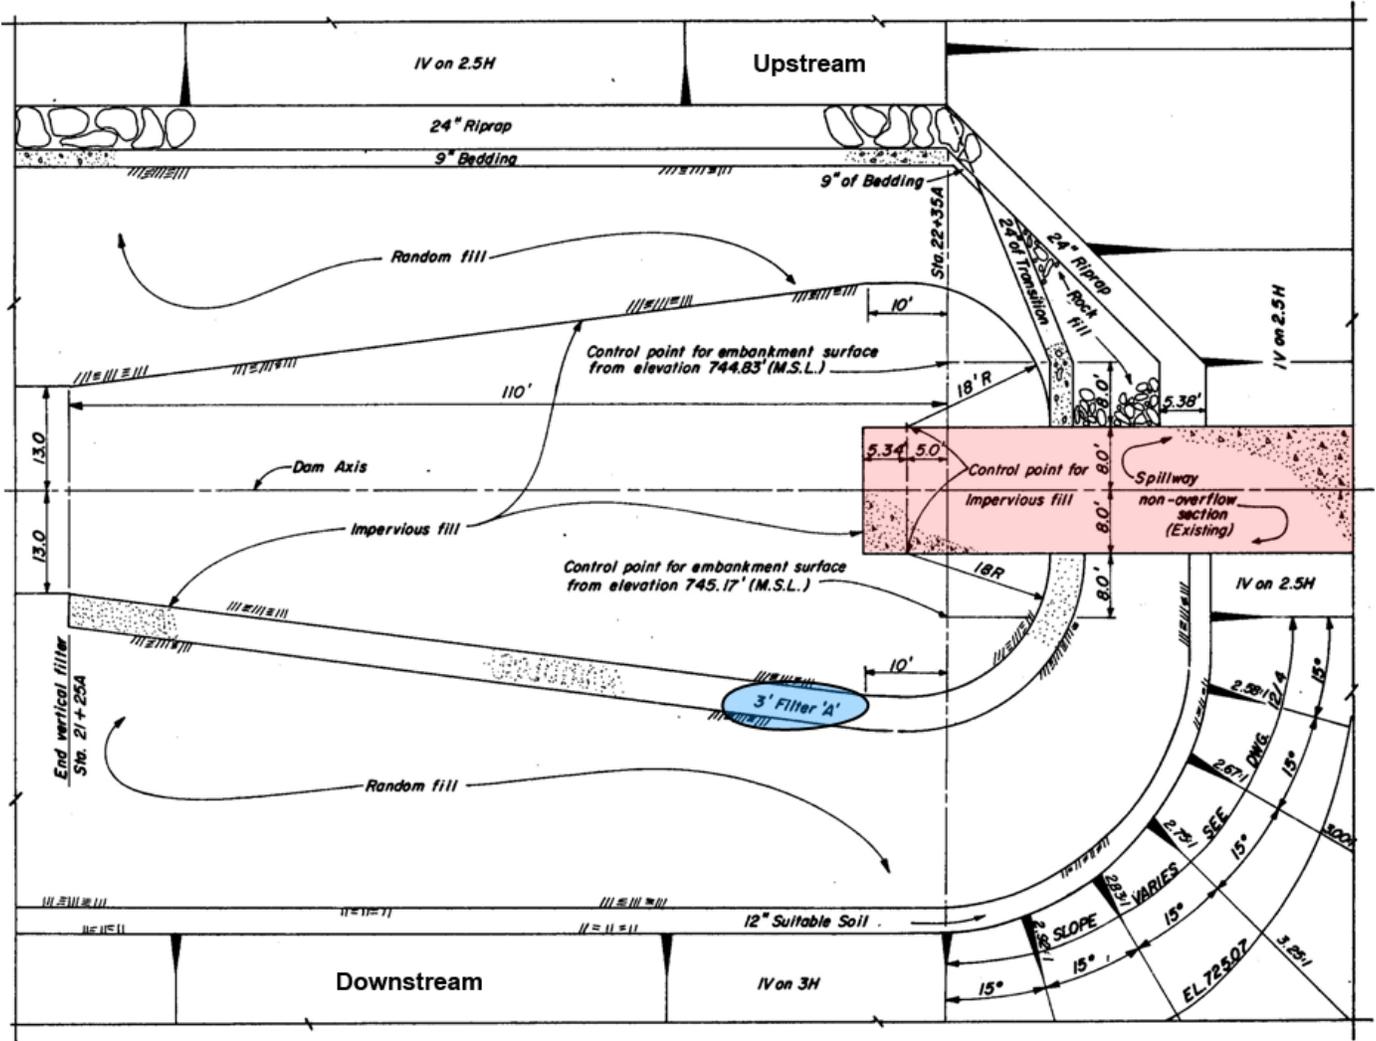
Filter protection used in the embankment section as it abuts the concrete section of a composite dam.
